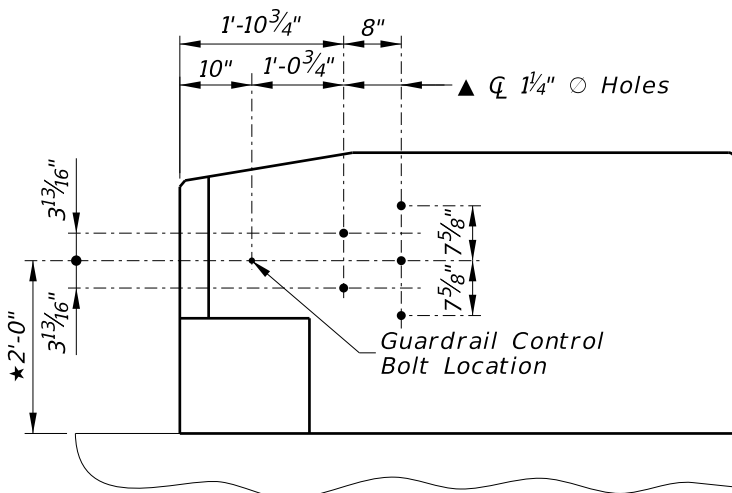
39 in. OCR Bridge Rail Reinforcing
